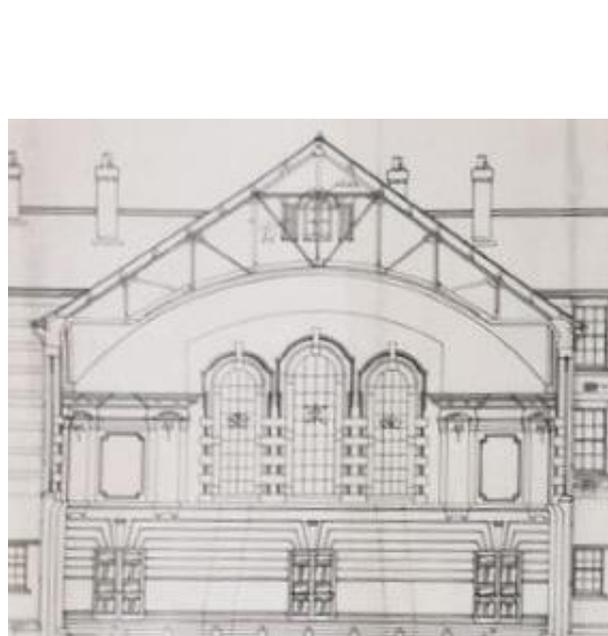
, Steel roof truss corbelled supports & Image 20, Architects plans showing wrought iron roof construction source: Author's own 2020 (Oatley & Skinner, 1902)
